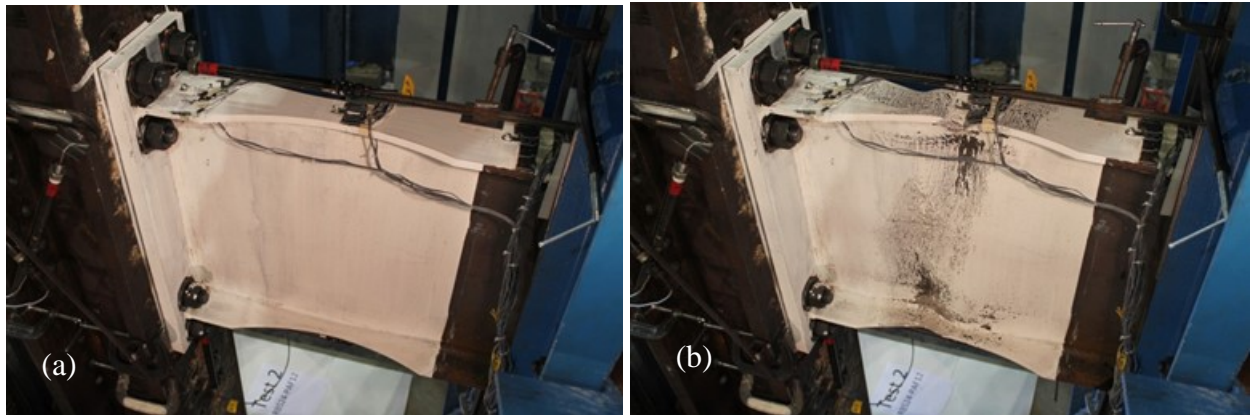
Angled View Pictures of Specimen 2 (W24x62 with RBS and PAF at 12 in.) at (a) Start of Test, and (b) Prior to Fracture
